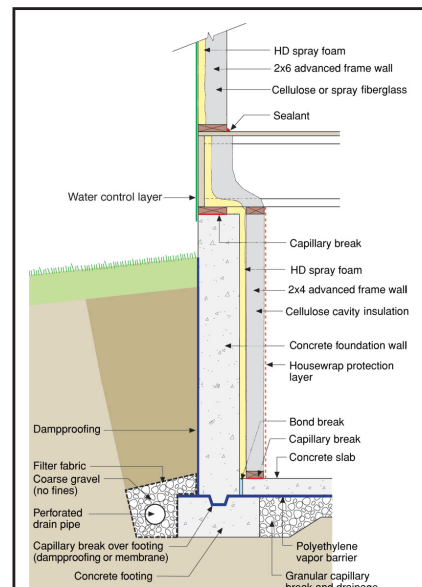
A hybrid approach for basement foundations can also be used in combination with fiberglass or cellulose insulation.
